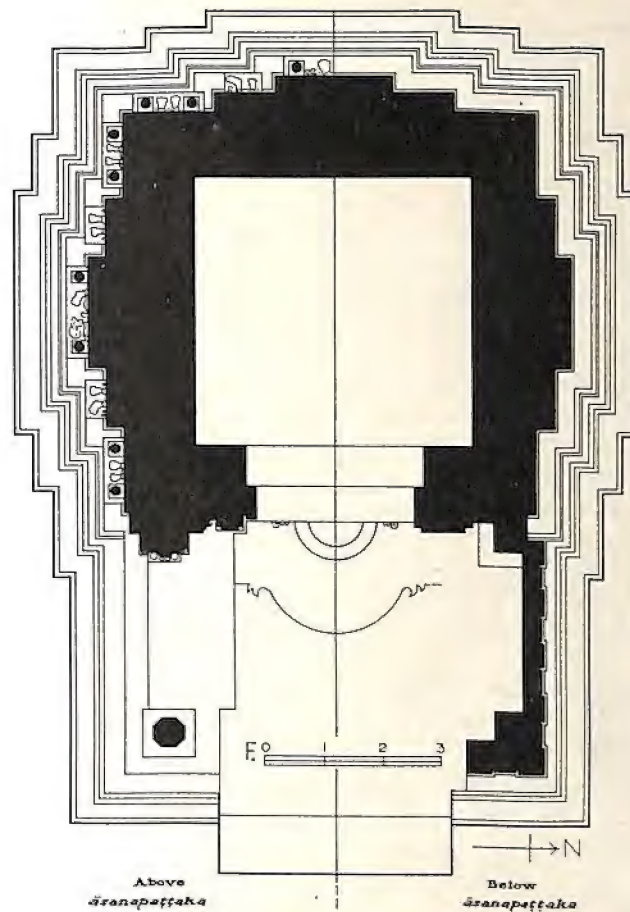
Saṇḍēr. Viṣṇu temple, plan.
